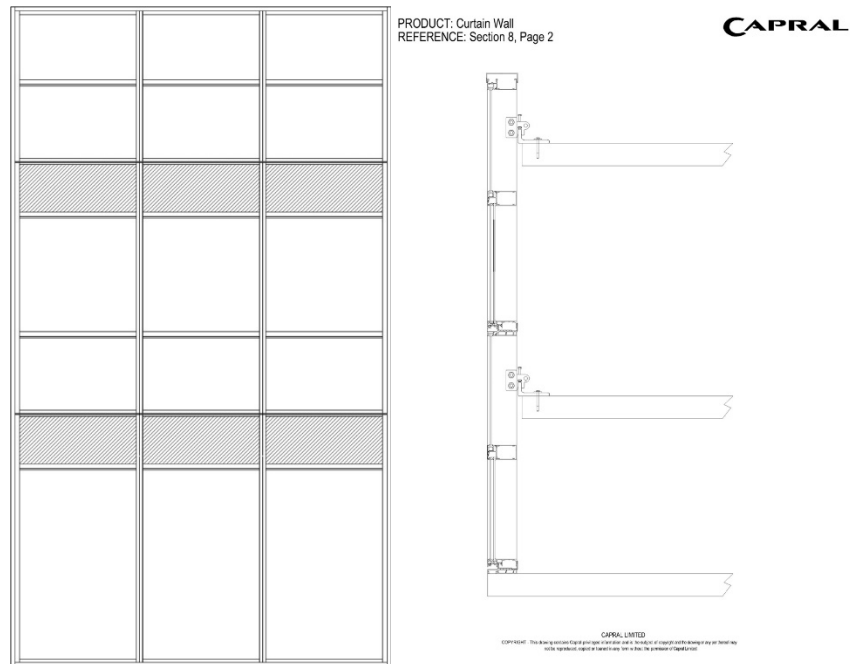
Typical curtain wall 'GAS' detail as provided by the Australian manufacturer Capral
